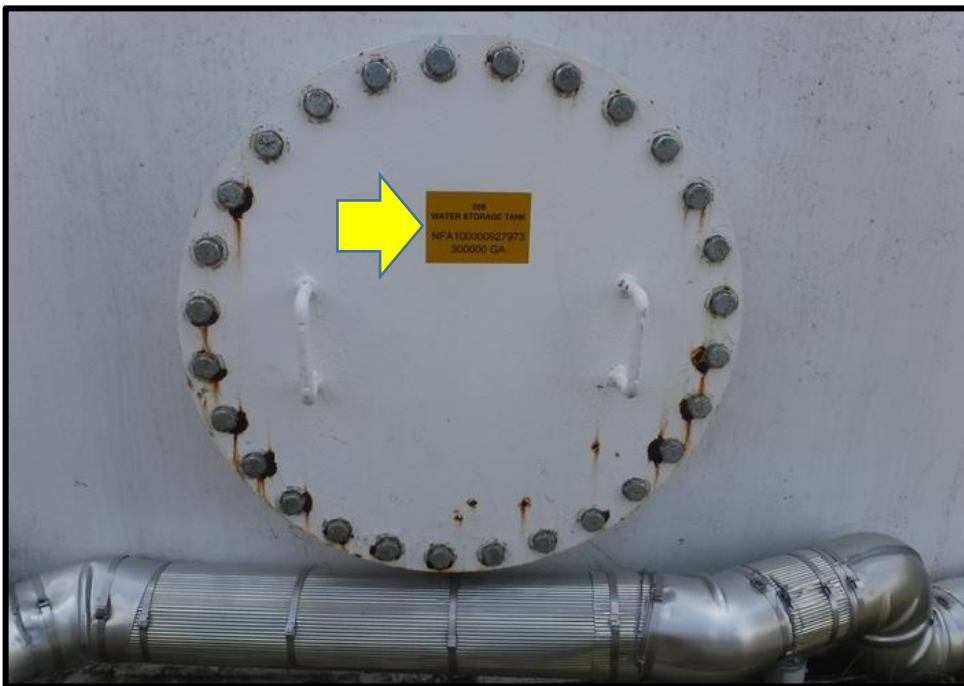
Shell manhole. Note tank information decal on the shell manhole cover.
